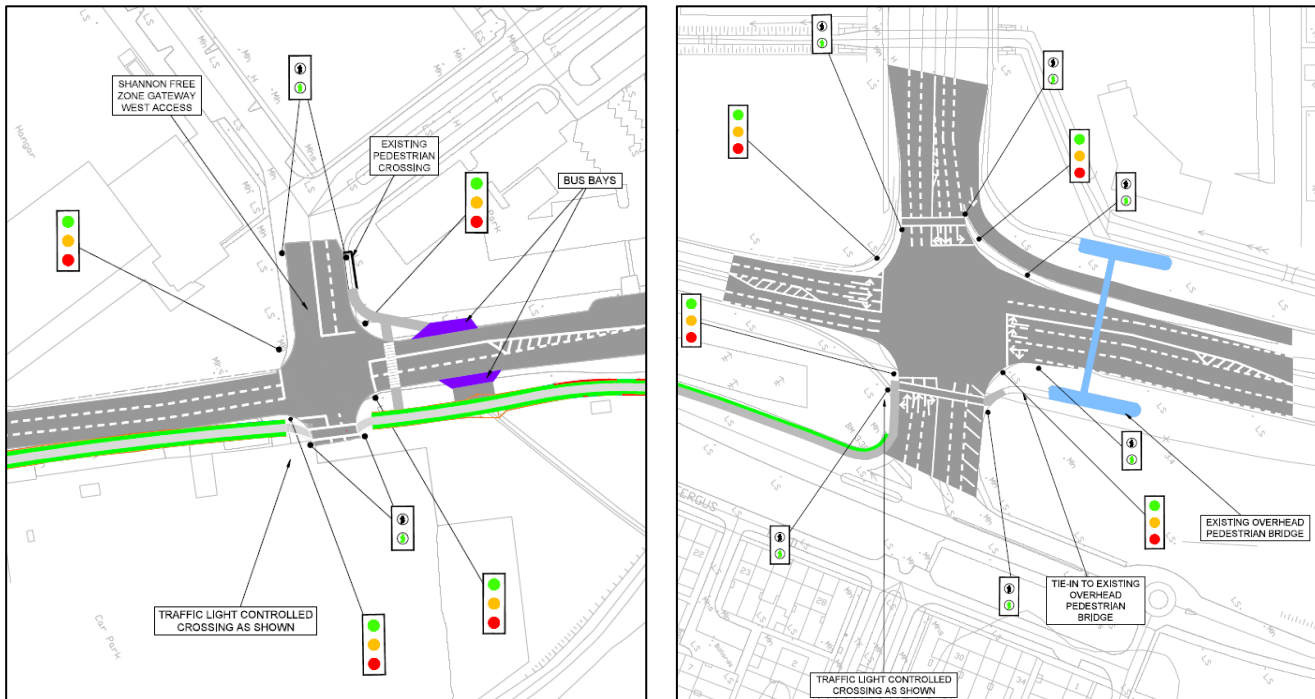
A: SFZ Gateway West Junction Upgrade Figure 8-1B- Drumgeely Roundabout Upgrade
